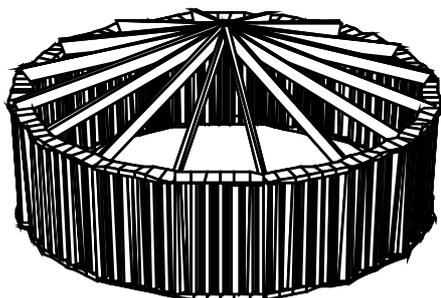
Computer model of staves and rafters showing independence of floor construction.
